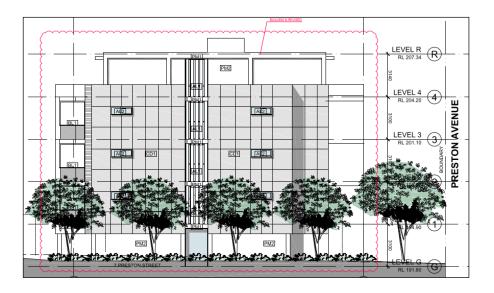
Building Separation Distances to No. 7 Preston Avenue
